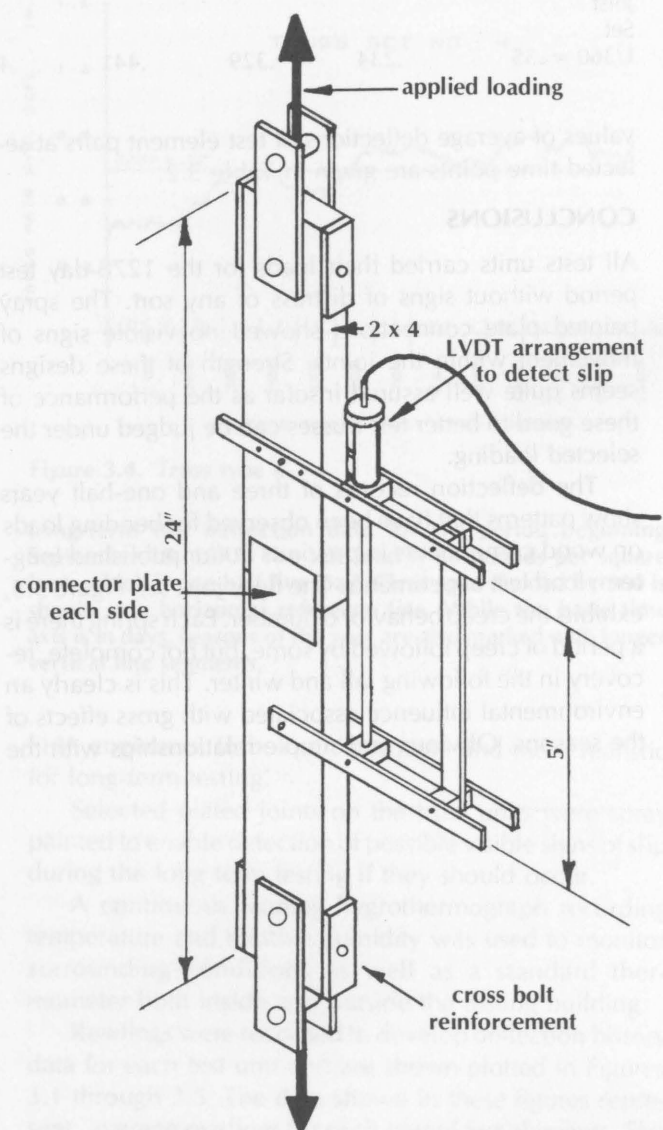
Tensile joint test specimen showing direction of applied load and instrumentation with LVDT to detect slip.
